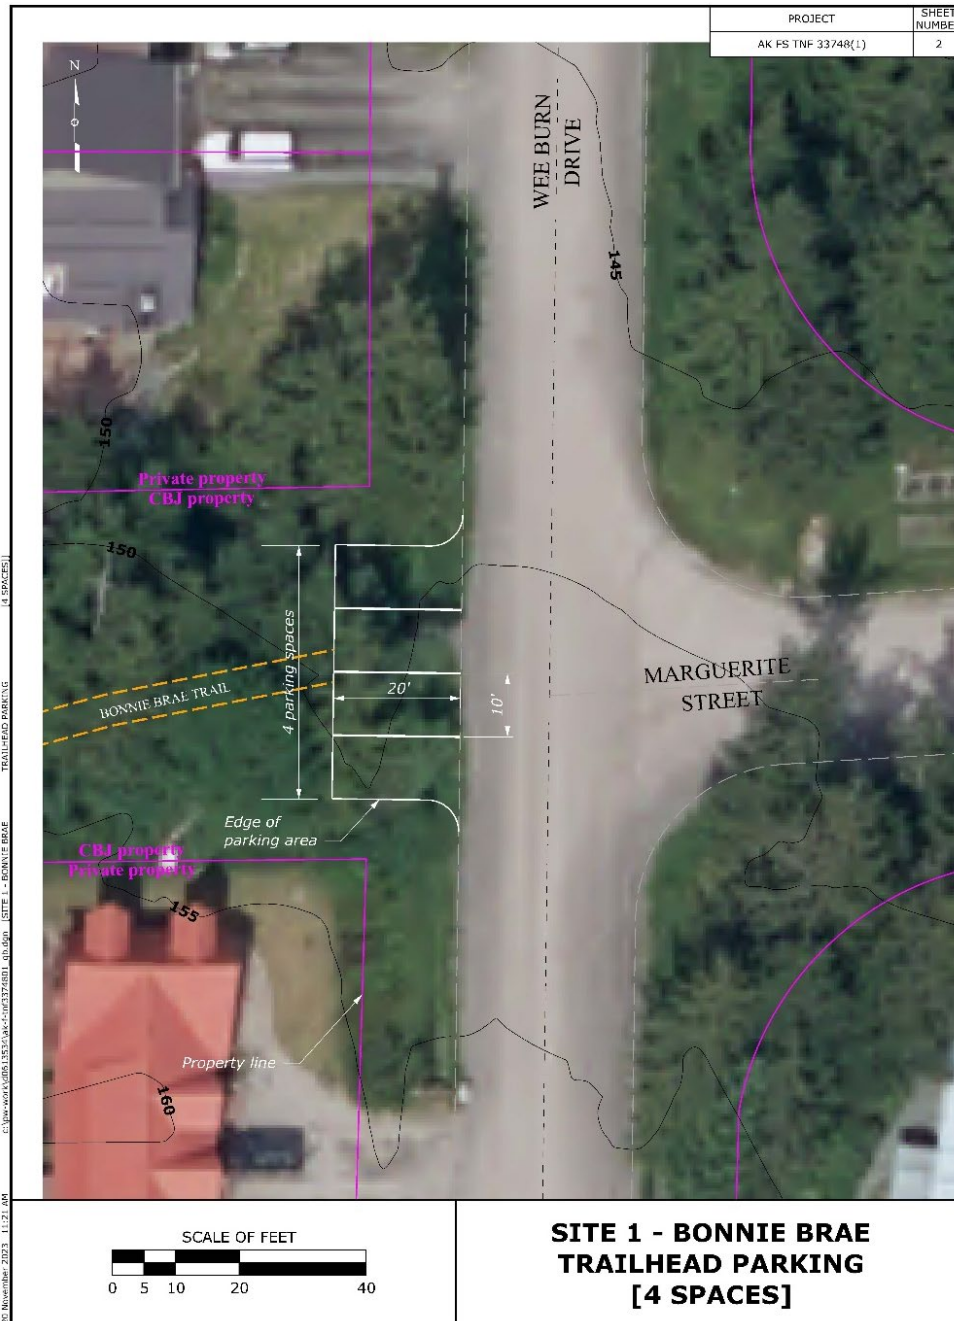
Initial Site 1 concept for parking at existing Bonnie Brae Access trailhead
